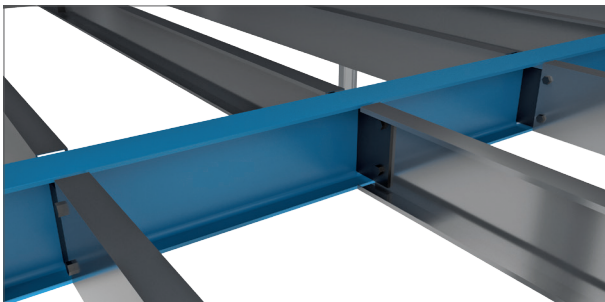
Detail of thin-walled floor beam inset connection to a girder of hot-rolled IPE section
